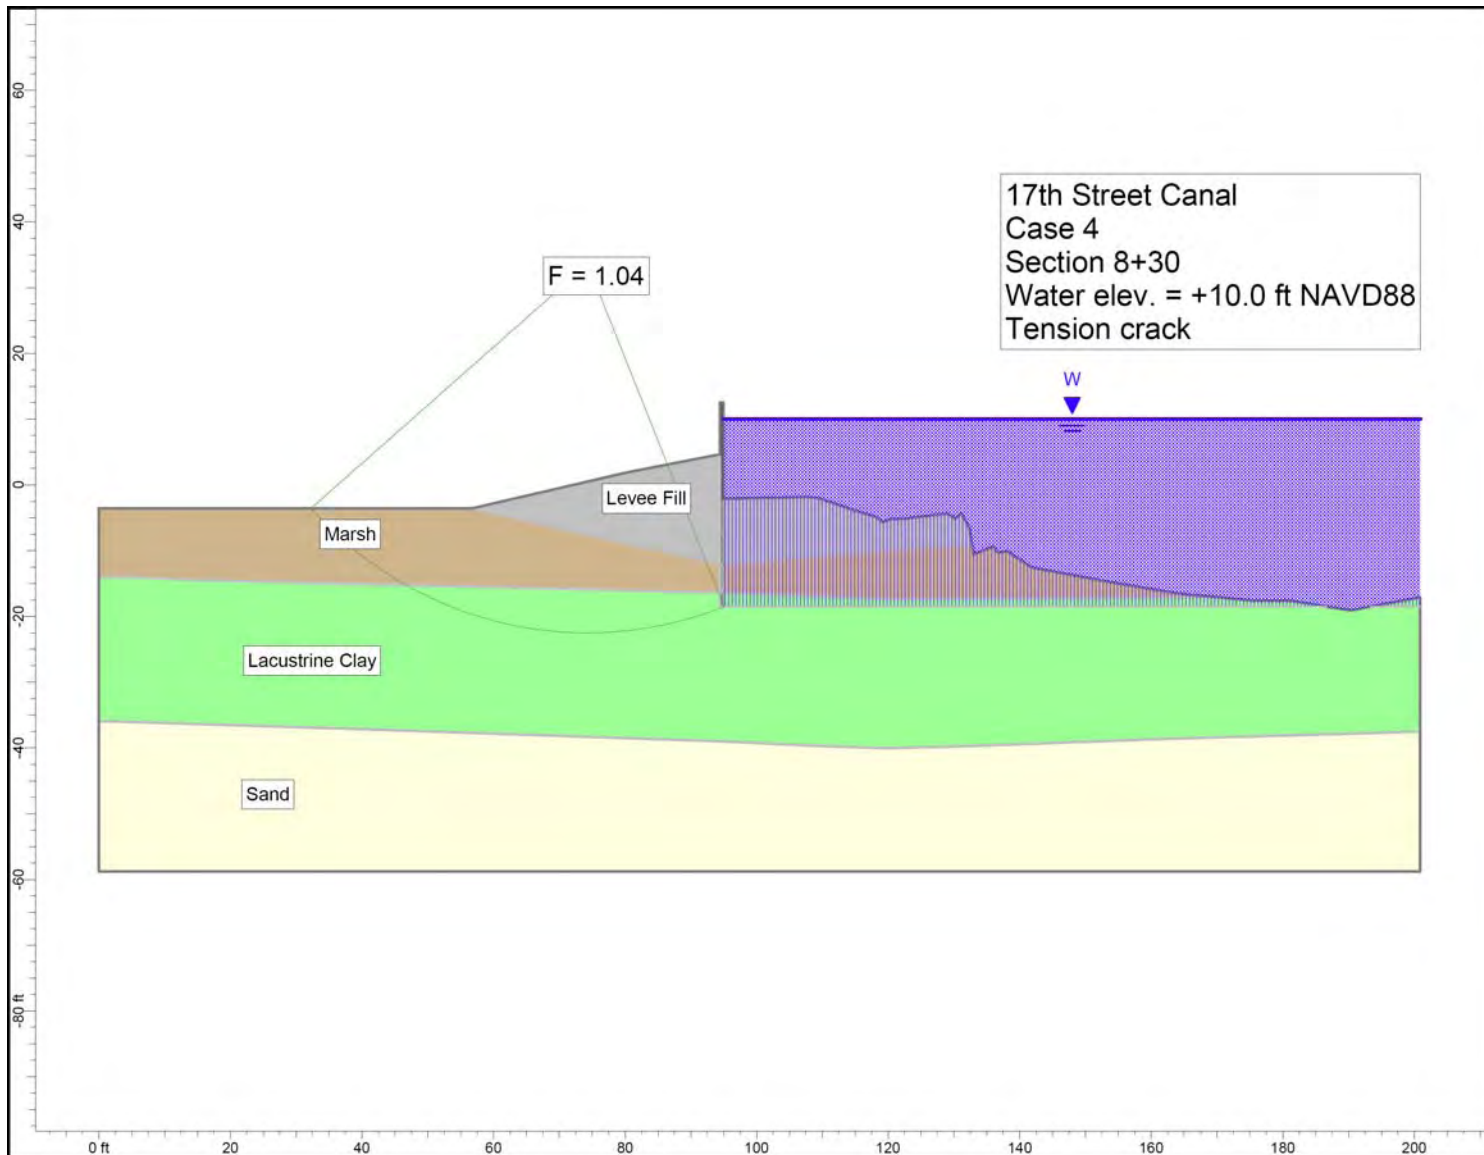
Critical Circle for 17th Street Canal Station 8+30 – Water Elevation 10 ft, Tension Crack
